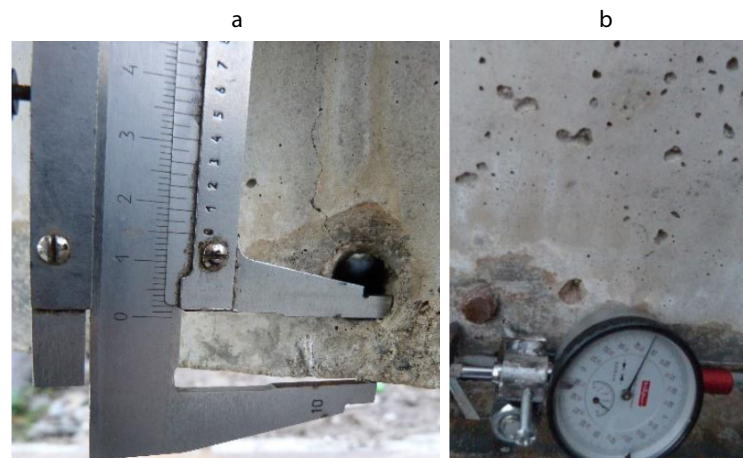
Beams with a hole instead of a cross-section bar (a) and beams with a cross-section bar (b)
